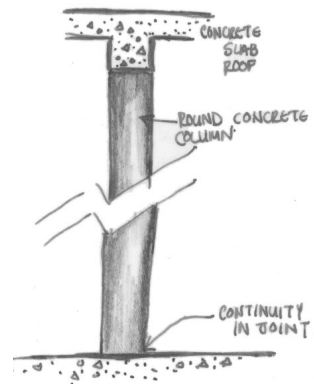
Sketch of concrete column and its connection to the ground and roof. Sketch by Author 2011
